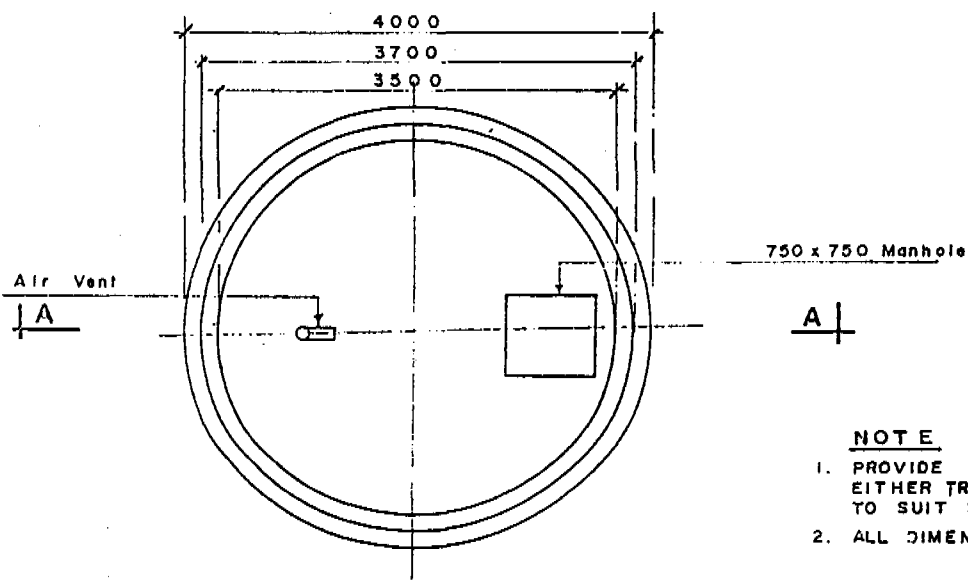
DETAILS & DIMENSIONS OF FERROCEMENT TANK
